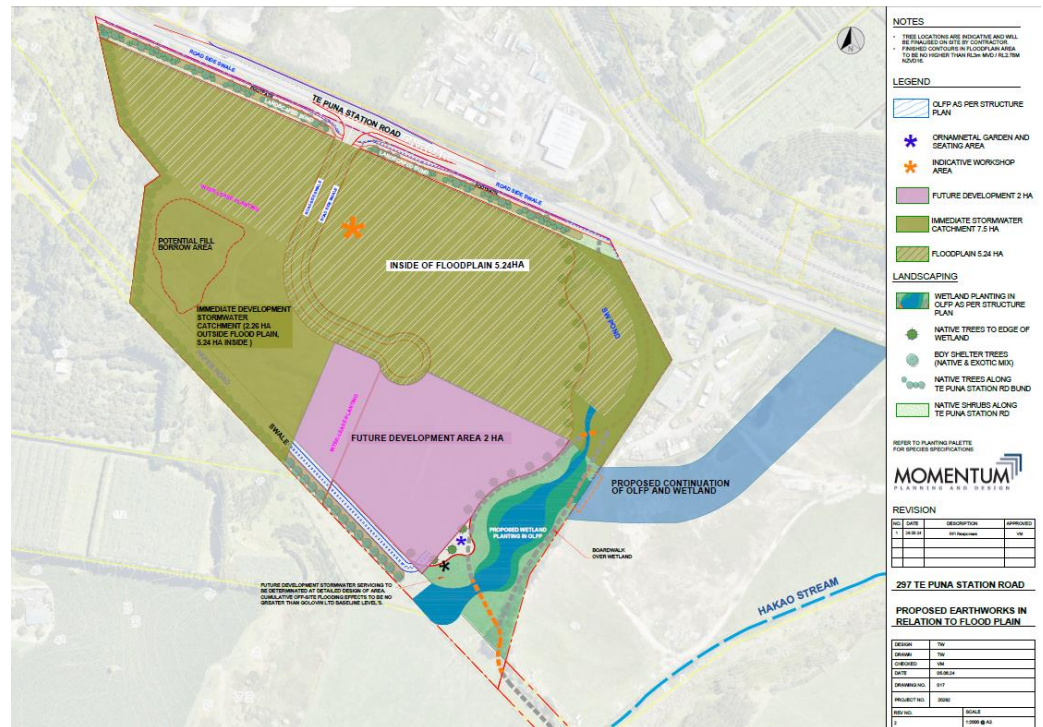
Proposed Earthworks required to enable development of site frontage on Te Puna Station Road and existing high ground on the southern boundary.
